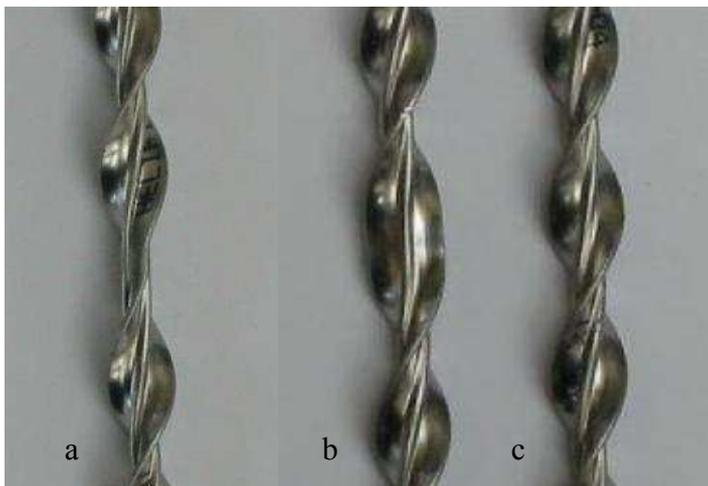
Fasteners: a) and b) after withdrawal tests perpendicular to the grain, c) fastener before test.
